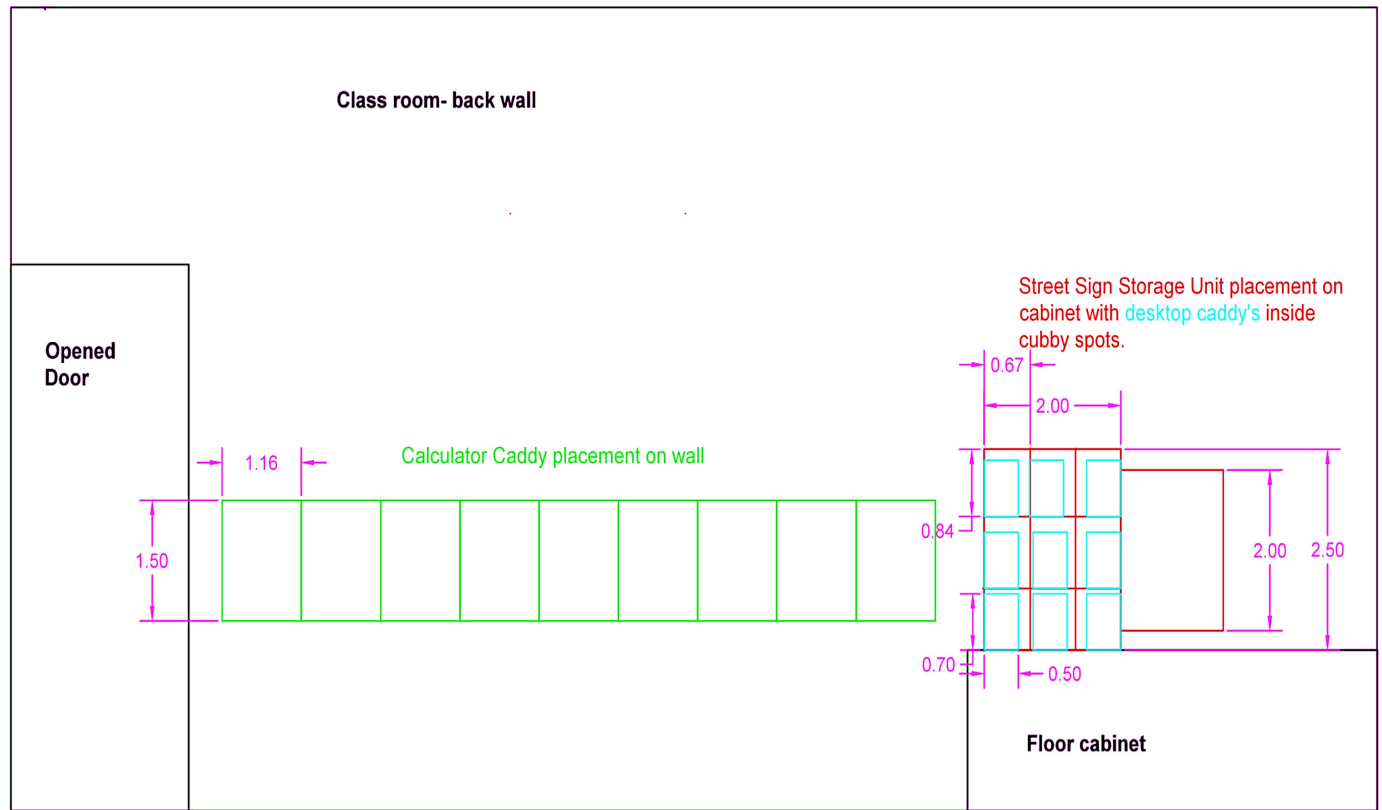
AutoCad drawing of placement of all 19 caddy designs in classroom (By Allison Tapaya).
